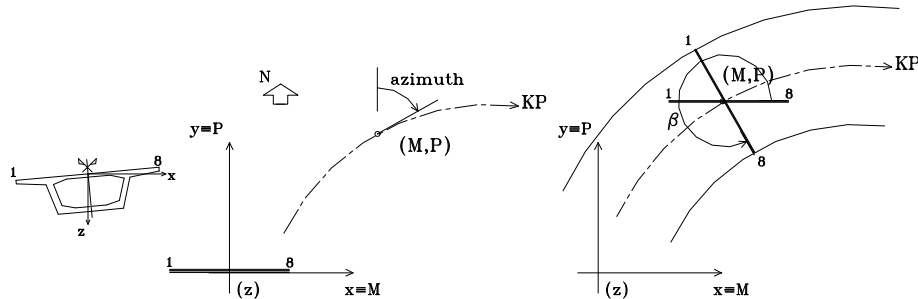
Cross-section adapted to the horizontal alignment geometry.
